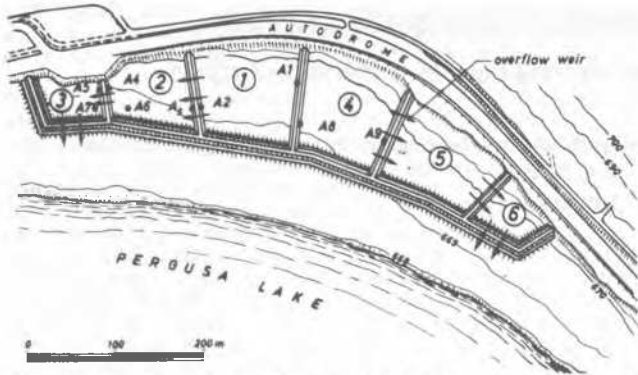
Plan of diked disposal area; A1, A2, .. settlement beacons.
